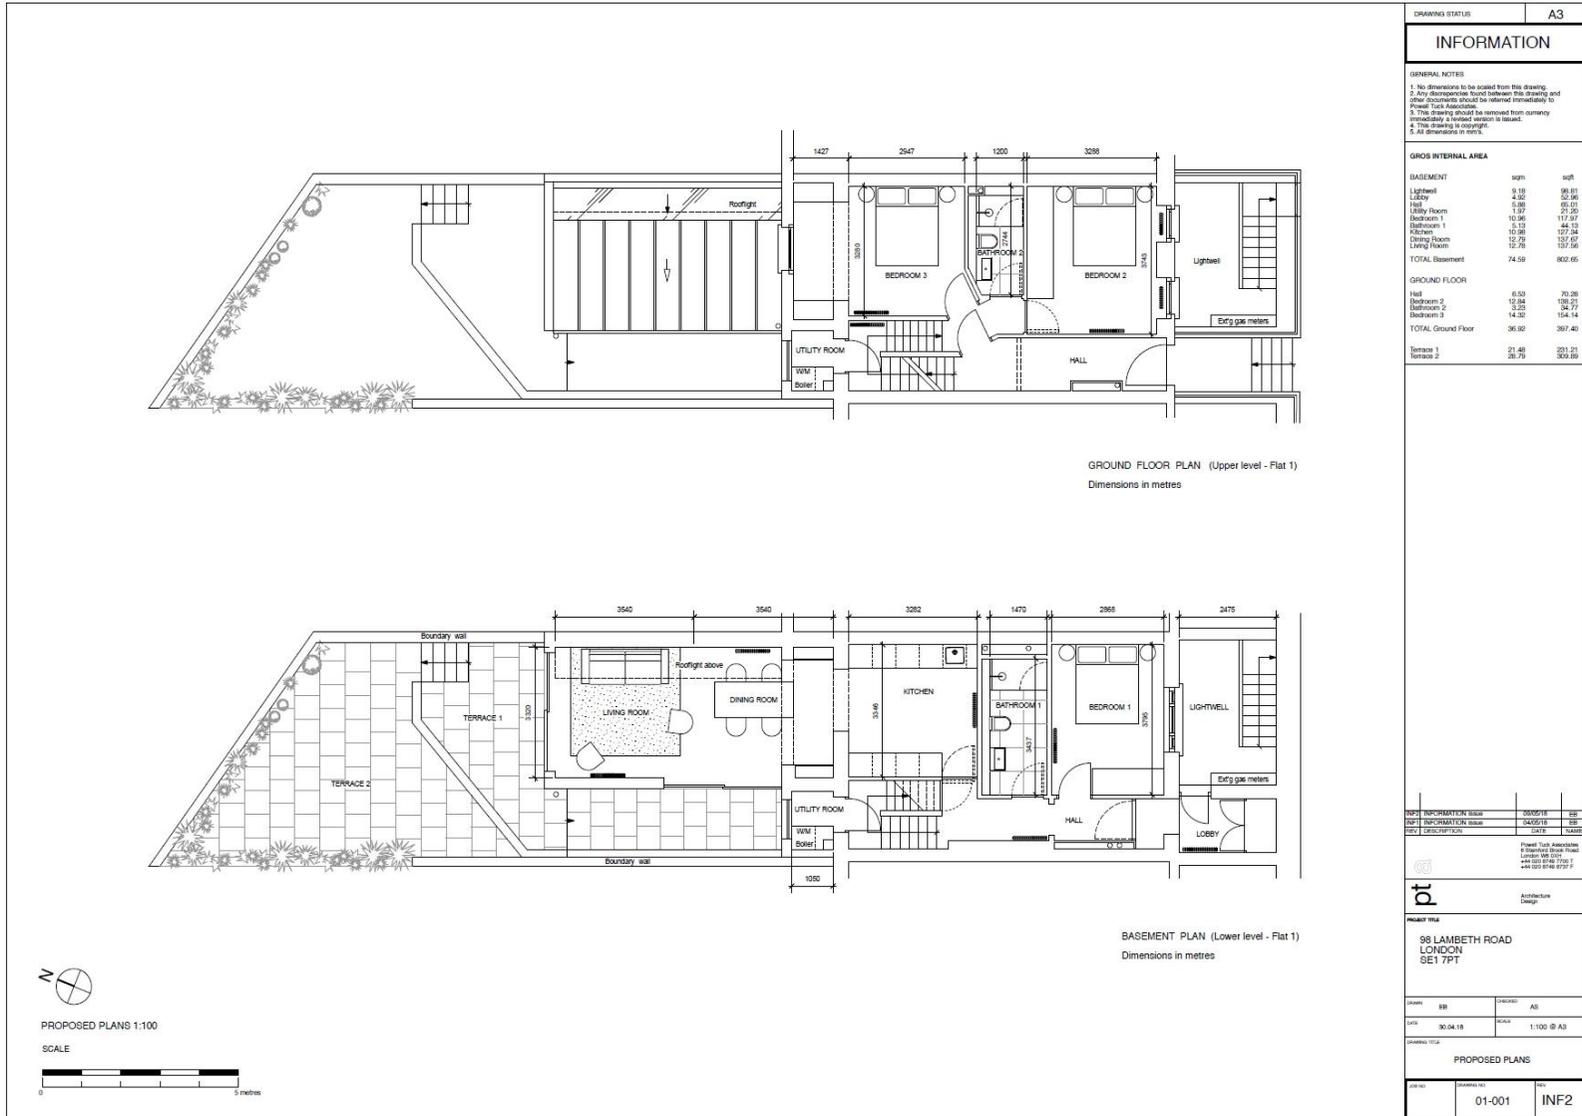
Basement and Ground Floor Plan of Flat 1 showing proposed alterations
